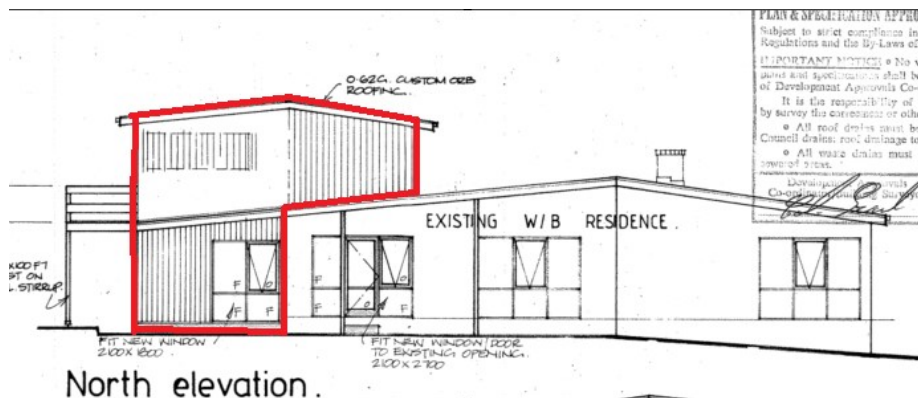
North side elevation, with the 1984 elevation outlined in red. (City of Sandringham, BP 9021/1984)
